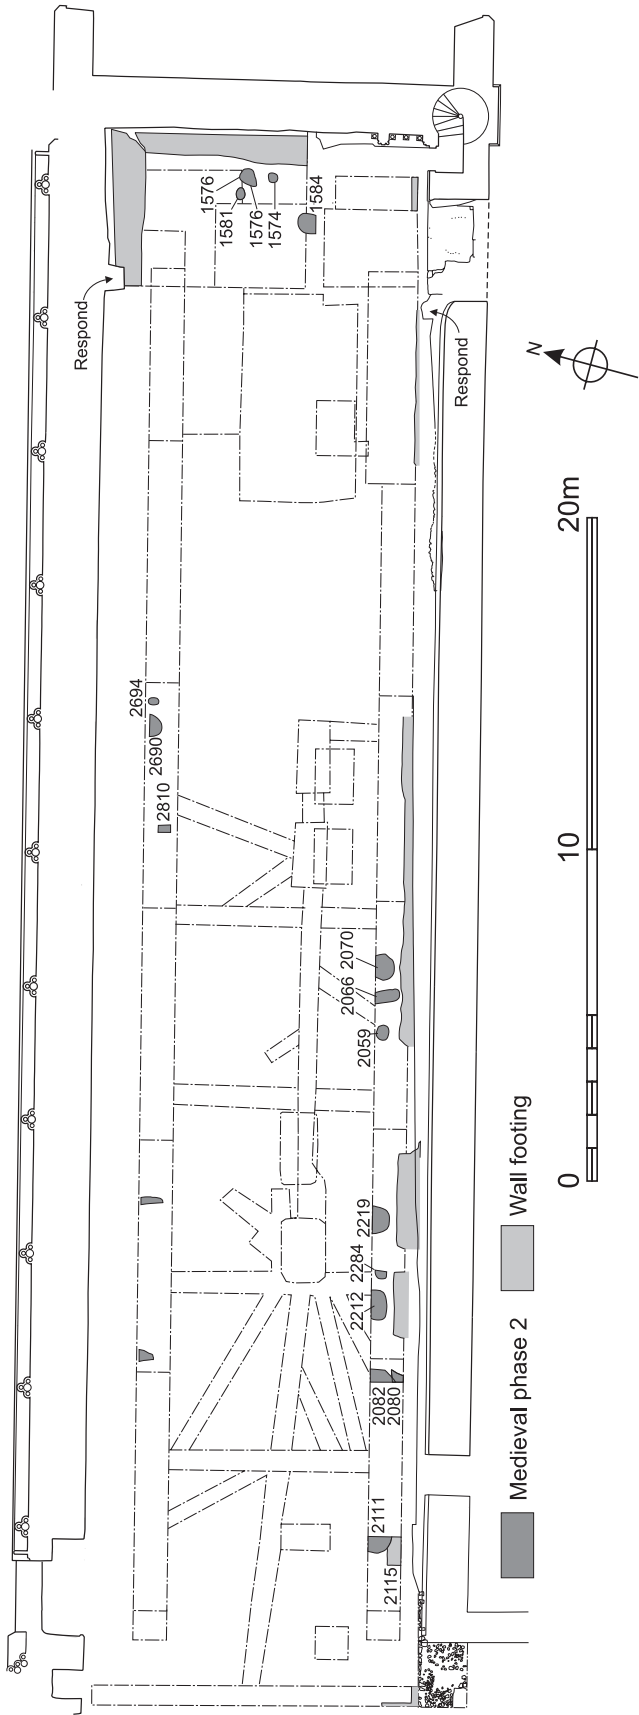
(above) Plan: medieval foundations and construction features. Scale 1:250
